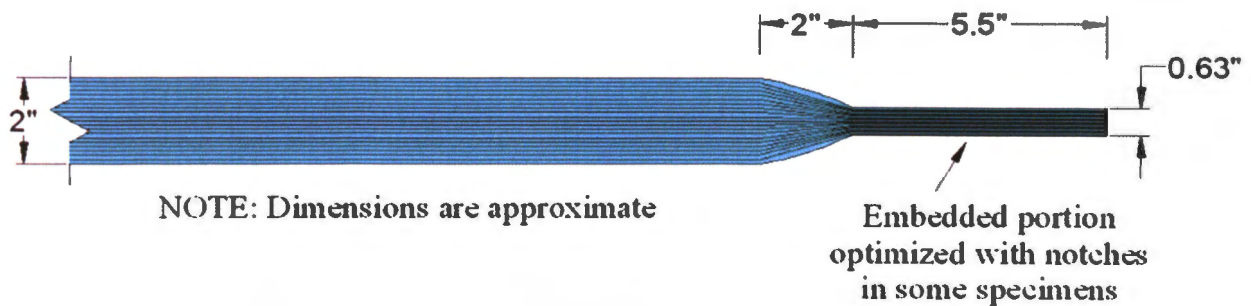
Details of 180° Anchor Spikes Studied in Sadone et al. (2010)
